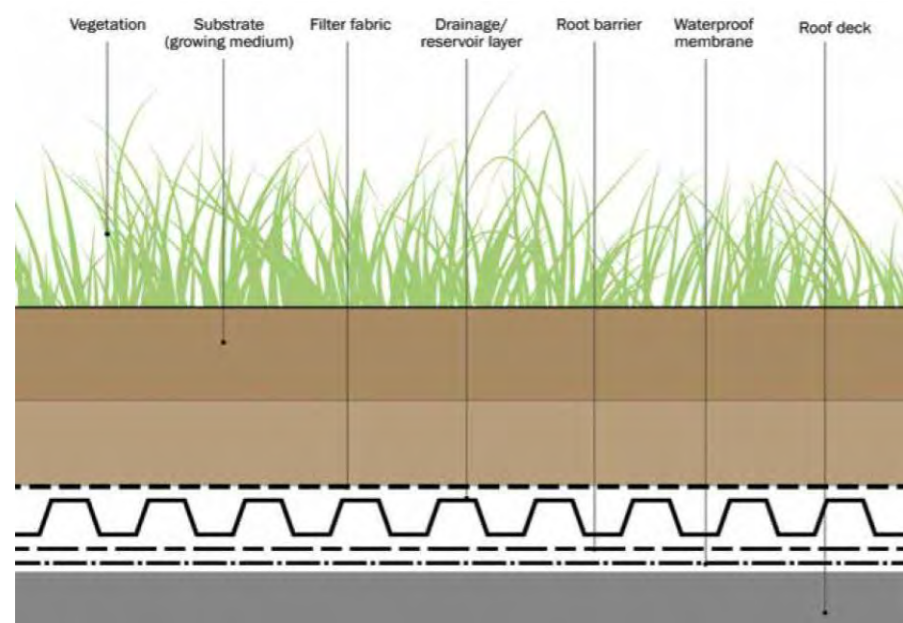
Green Roof Layers (Extract from Ciria C753)
